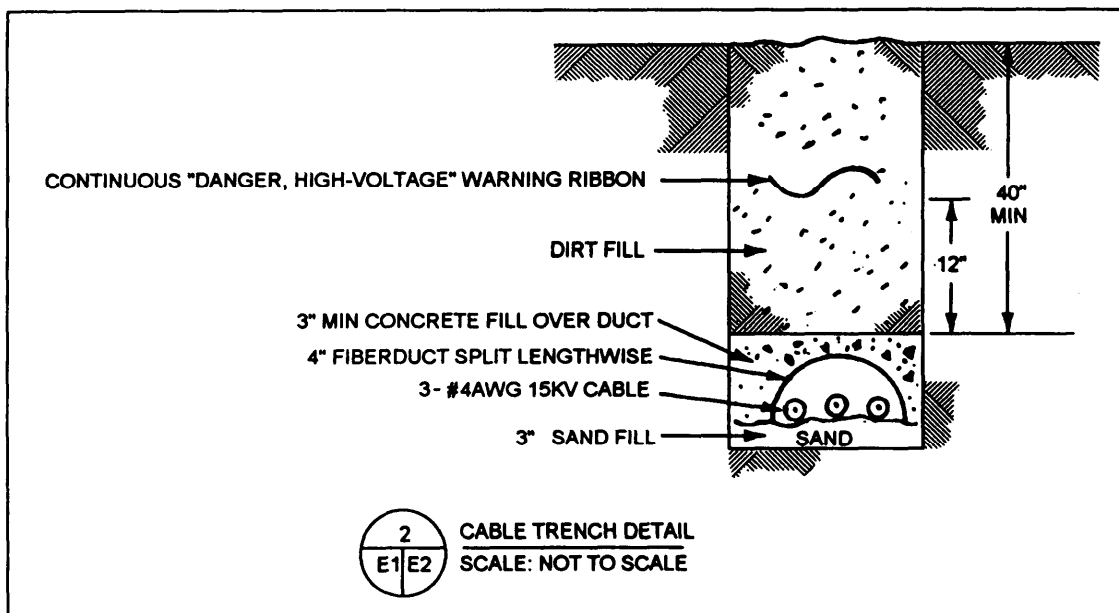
Cable-trench detail for use with the site plan shown in Figure 2-15.
